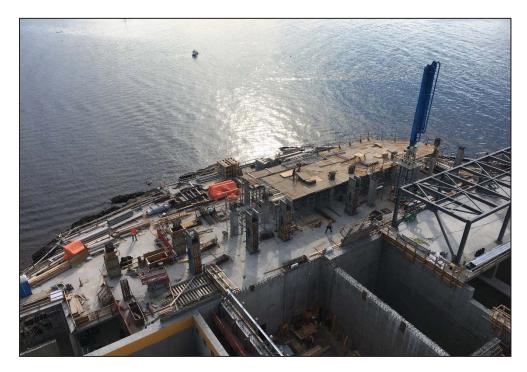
McLoughlin Point Wastewater Treatment Plant- View of operations and maintenance building from tower crane B.
